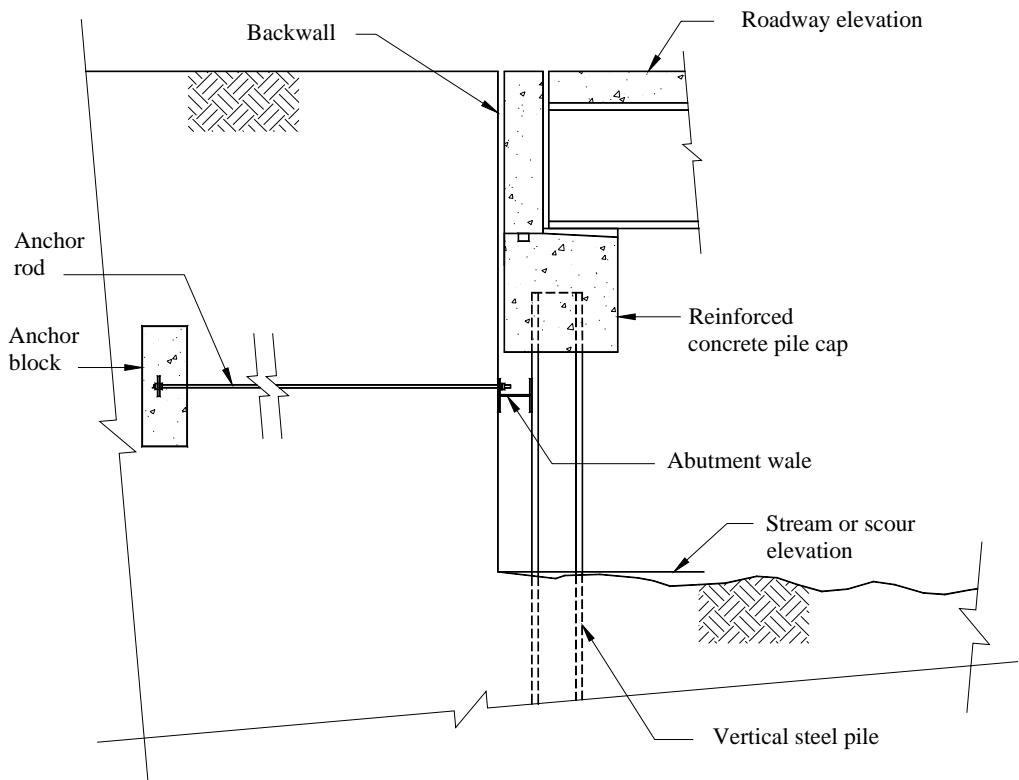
Typical Iowa county stub abutment using a cast-in place reinforced concrete pile cap.
